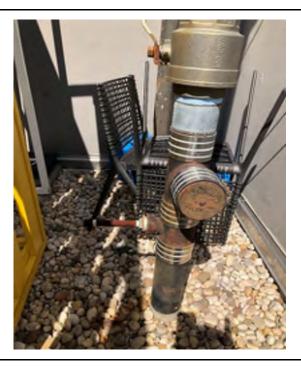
V6 riser and sample port in good condition, facing northwest. 8 April 2021.
